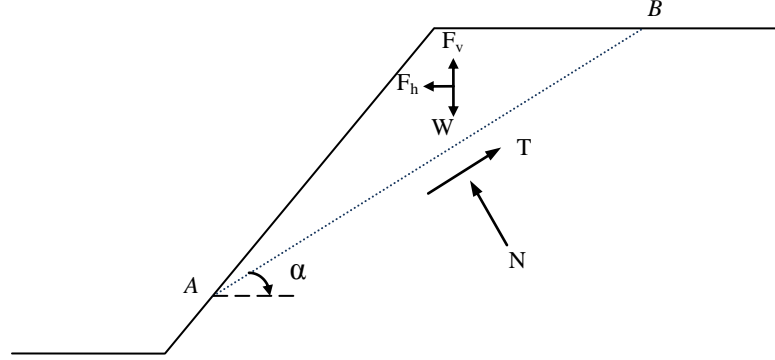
Planar slope failure with pseudostatic forces acting on the slope
